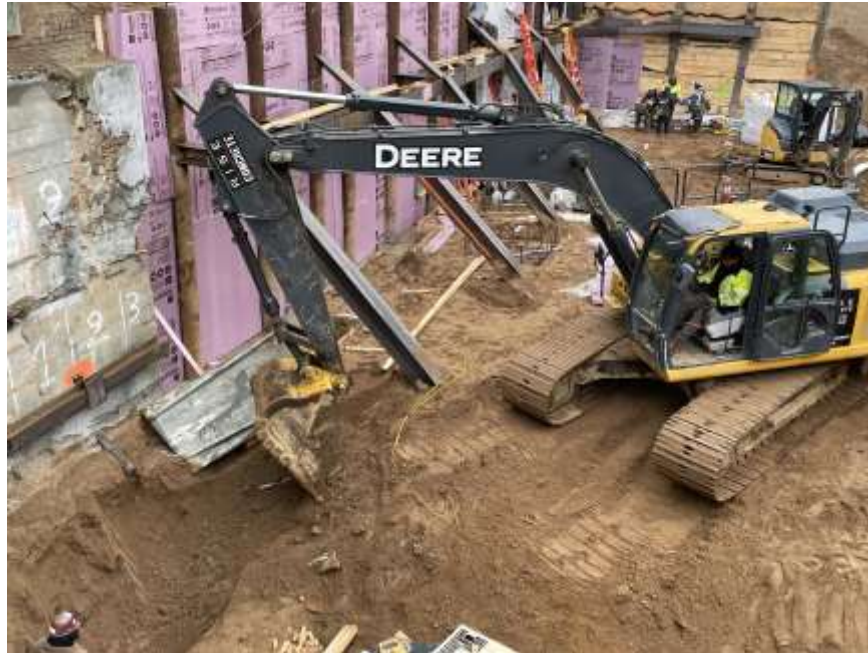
View of Rise excavating an area in the southwest part of the the site (facing northwest).
